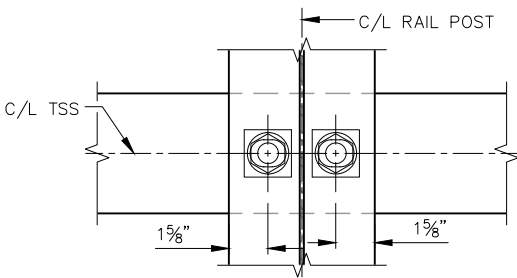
DETAIL AT END POST (THRIE BEAM RAIL ATTACHMENT)
